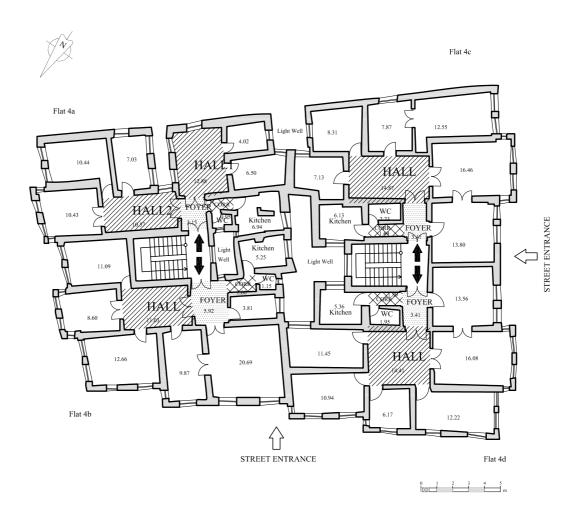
a. Petraki Apartmanı (Apartment 4), plan
